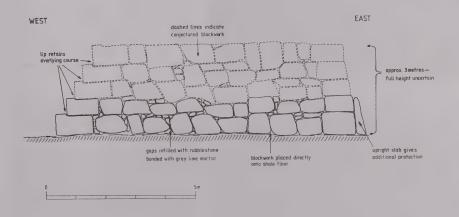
Schematic section looking north across the north section of the alum house breakwater
